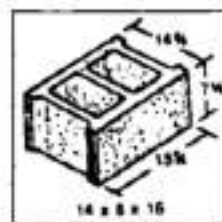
TYPICAL SHAPES OF CONCRETE BLOCK
